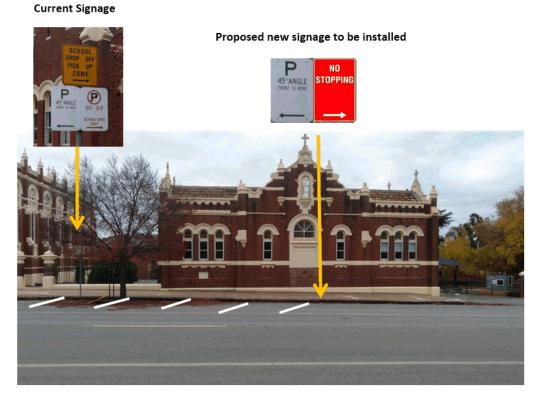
Proposed Changes to Loftus Street Parking West of St Annes School Driveway
